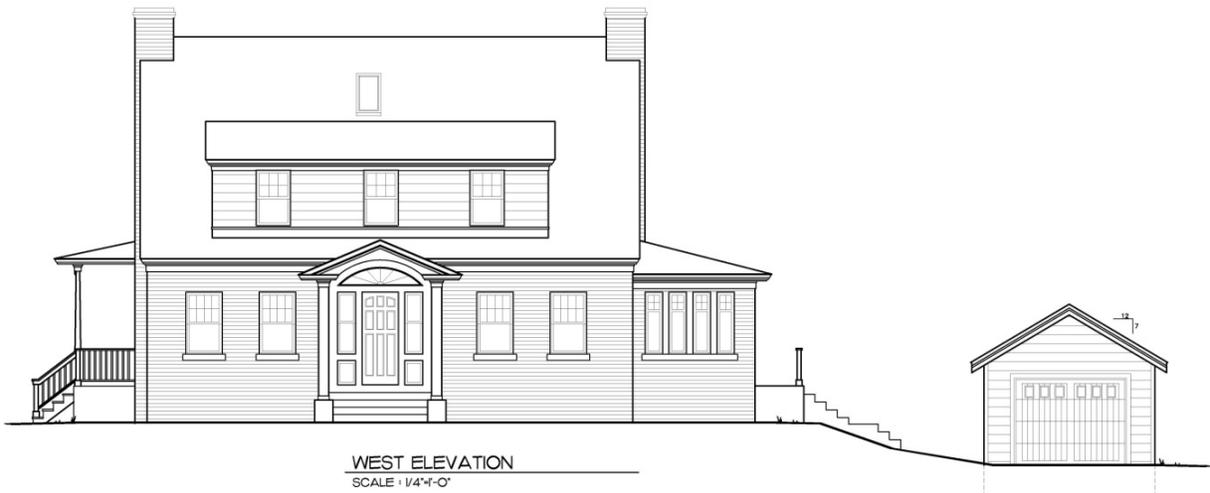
Proposed garage (right) in context with the primary house (left), west facades.
